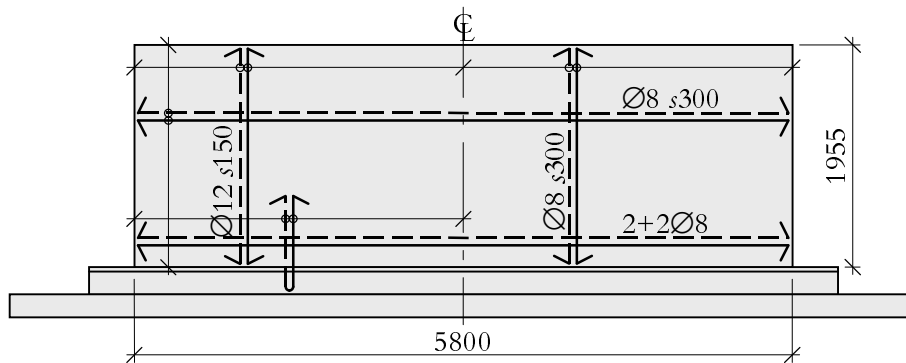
Elevation of wall in Test I and Test II: measures and reinforcement. Measures in millimetres.
